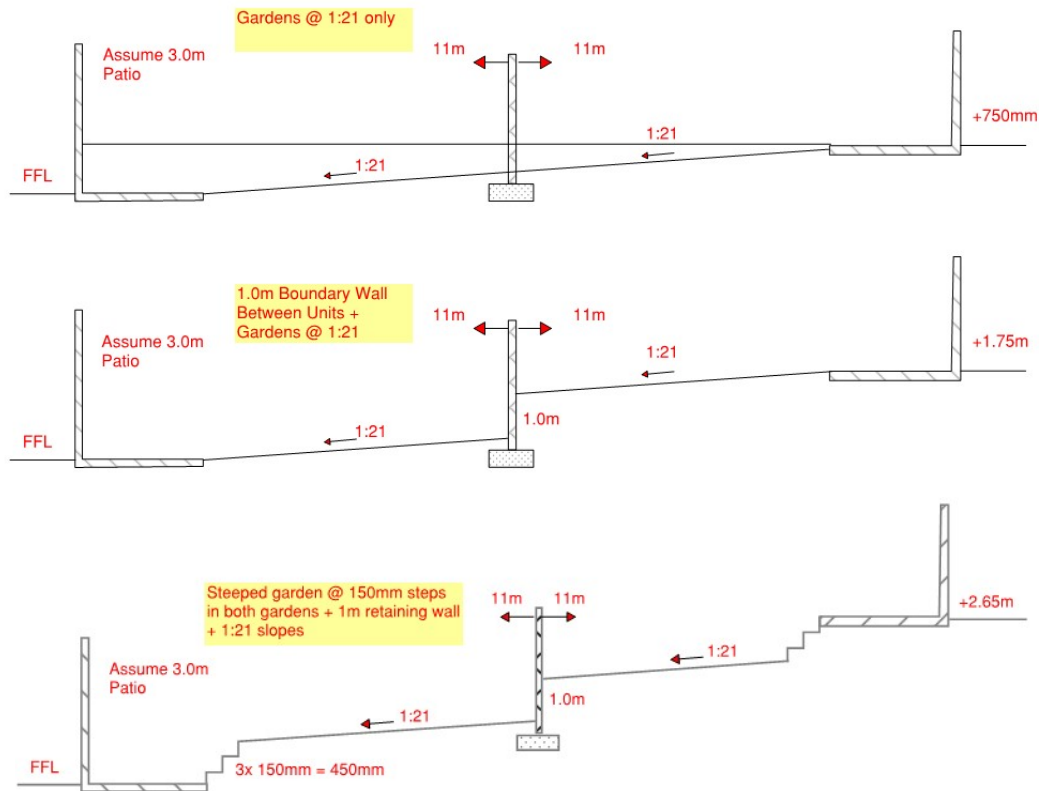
Typical details of adjacent back gardens for between 750mm and 2.65m difference in FFL
